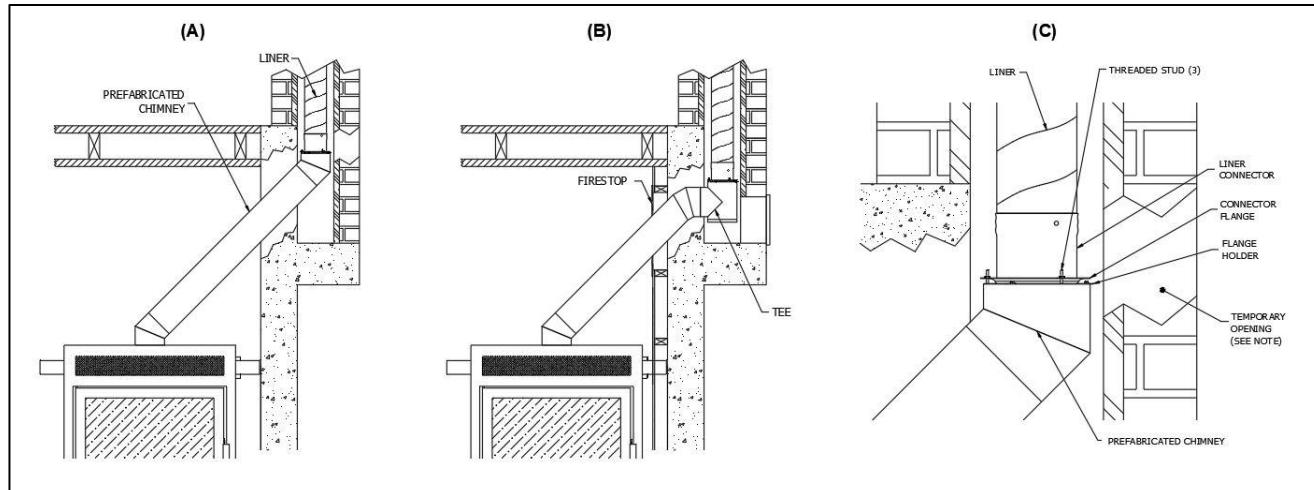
(A) Connection into a masonry chimney through an elbow/liner; (B) connection into a masonry chimney through a tee/liner; (C) detailed drawing of masonry chimney connection.
